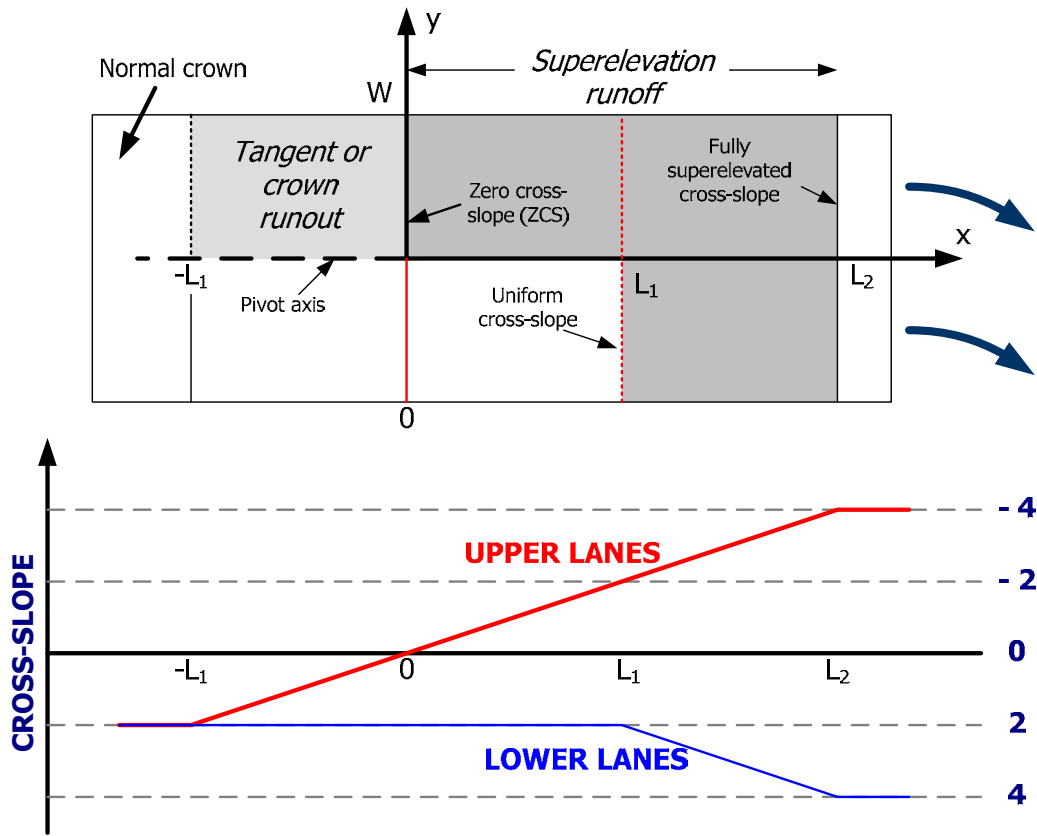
Lateral alignment at superelevation transition with superelevation cross slope = 4%
